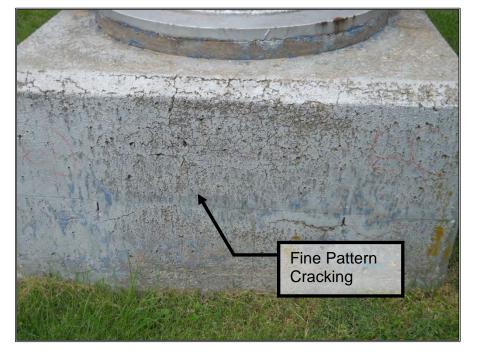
Fine Pattern Cracking at Footing No. 6.
